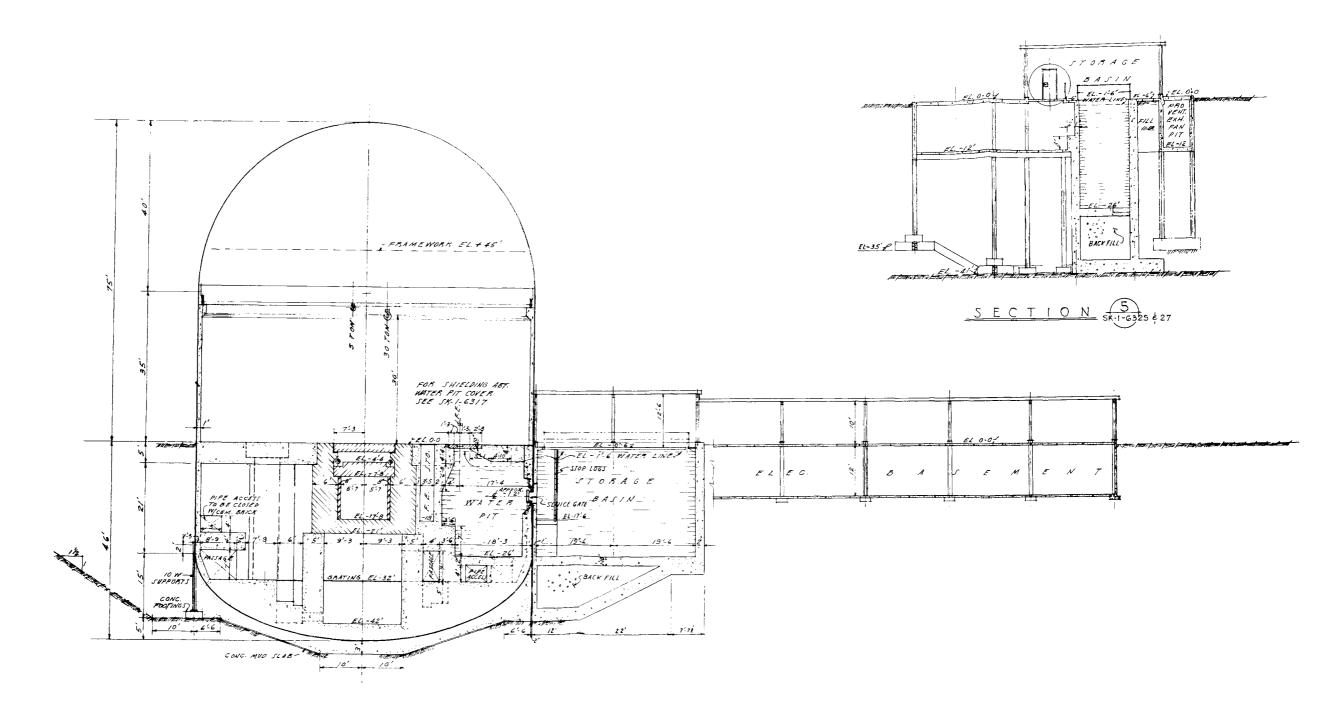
Longitudinal Section of Building (SK-1-6329)
